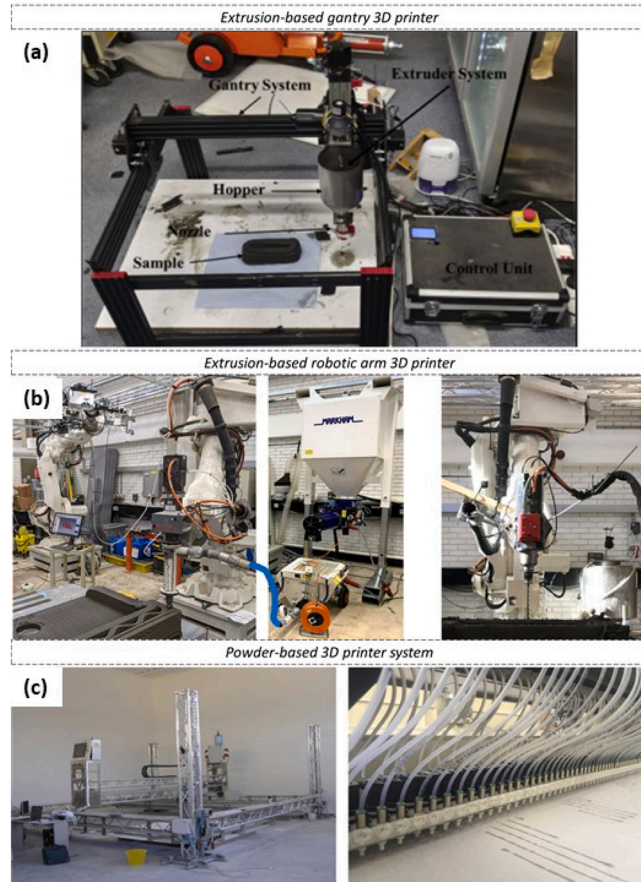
3D printing technologies: (a) extrusion-based gantry-type 3D printers [60], (b) extrusion-based robotic arm-type 3D printers [61] and (c) powder-based 3D printer [62].
